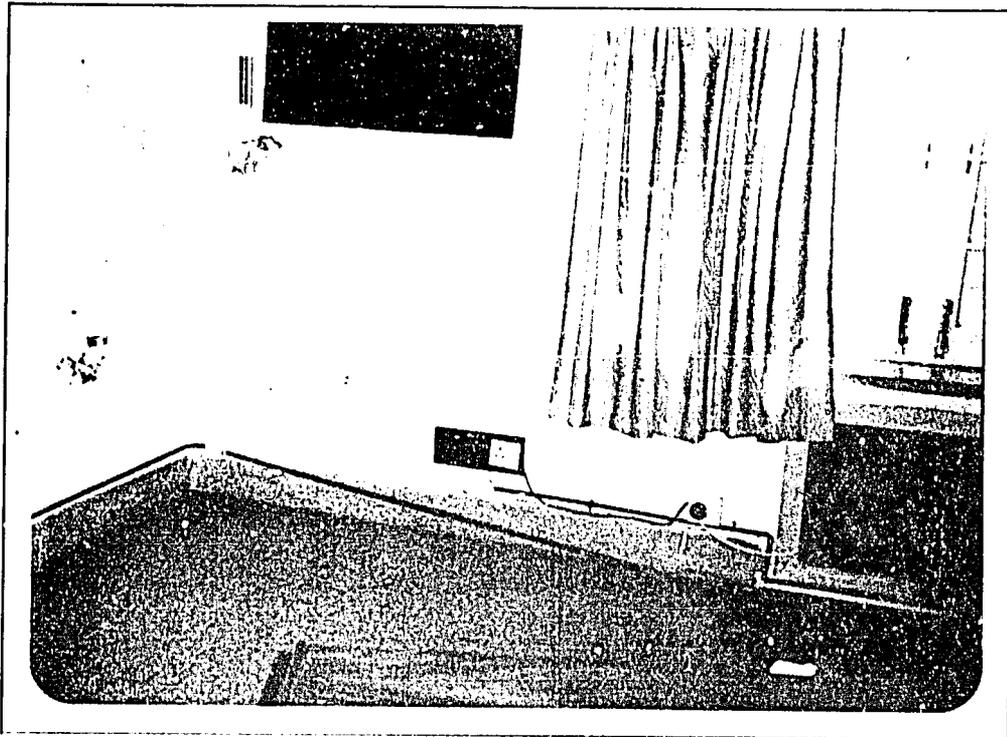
Peshawar DAI Office Facility. Director's Office. Cable to be run from hallway into room along existing PVC conduit to corner.
